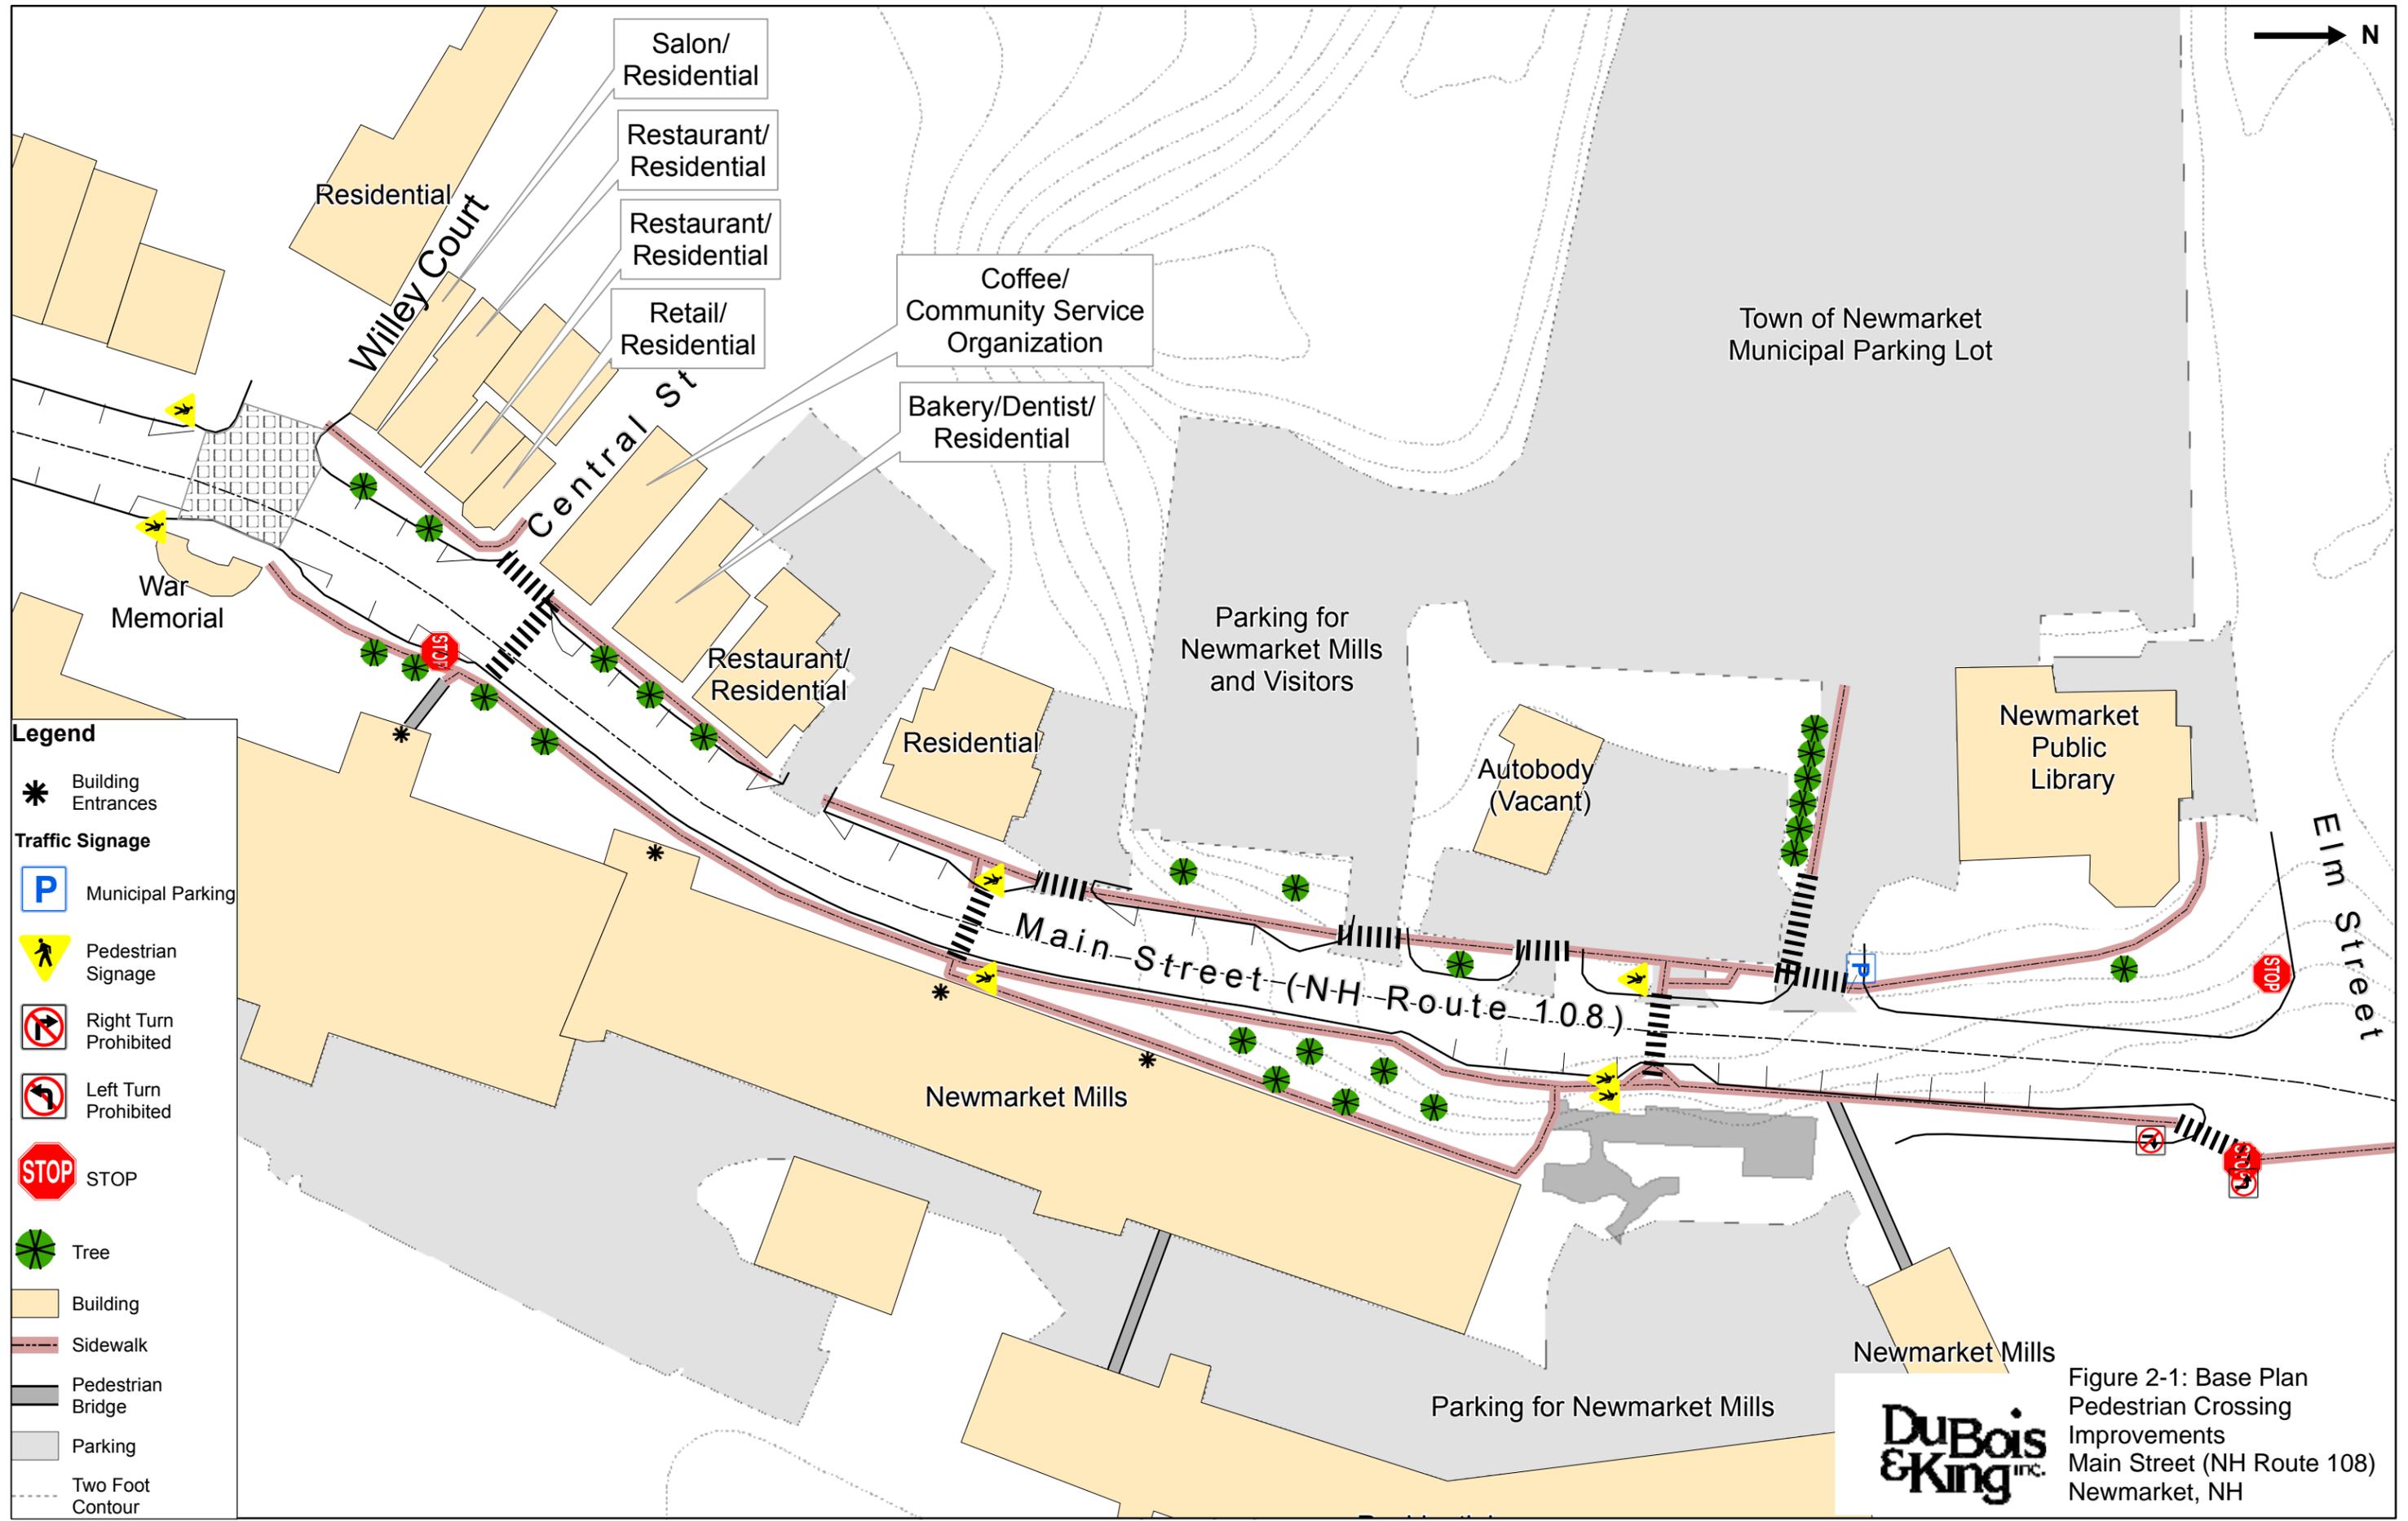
Base Plan Pedestrian Crossing Improvements Main Street (NH Route 108) Newmarket, NH
